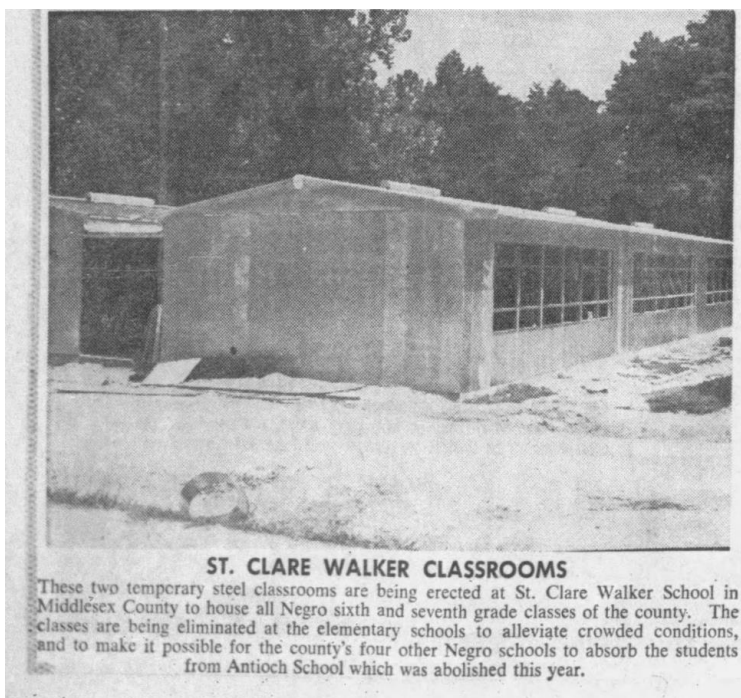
St. Clare Walker School, 1959 Classroom Building, view NE.
